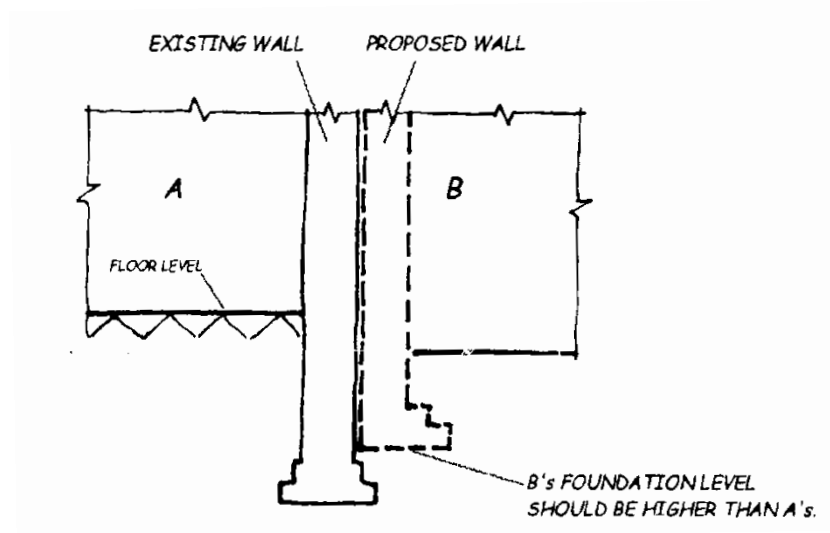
A schematic illustration of the rights regarding the building of a new wall adjacent to an existing wall (Source: Hakim, B., 2001, p.17).
